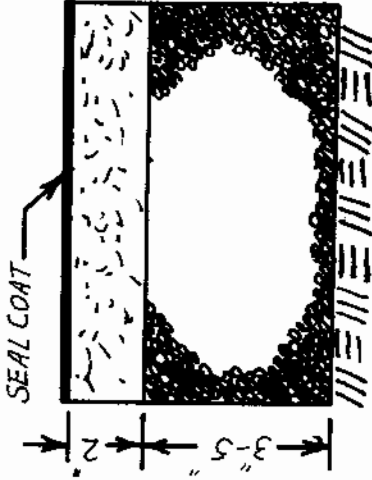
Typical Bicycle Path Design Sections. (Generally the same as sidewalk design sections)
